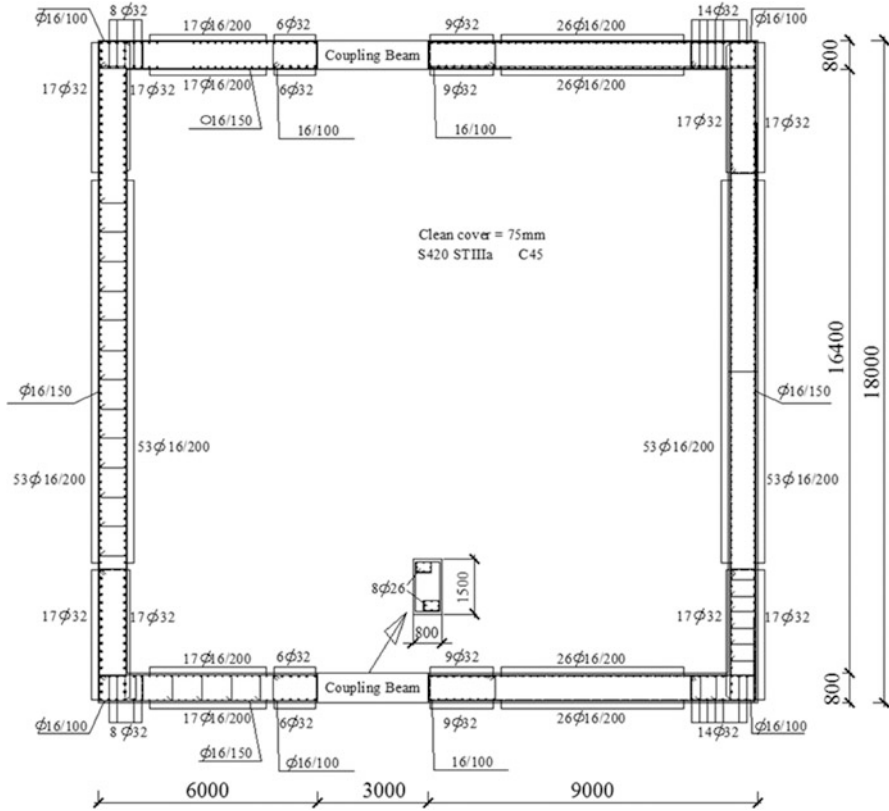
Non-symmetrical coupled wall core system of a 45 story-180 m tall building with diagonally reinforced coupling beams
